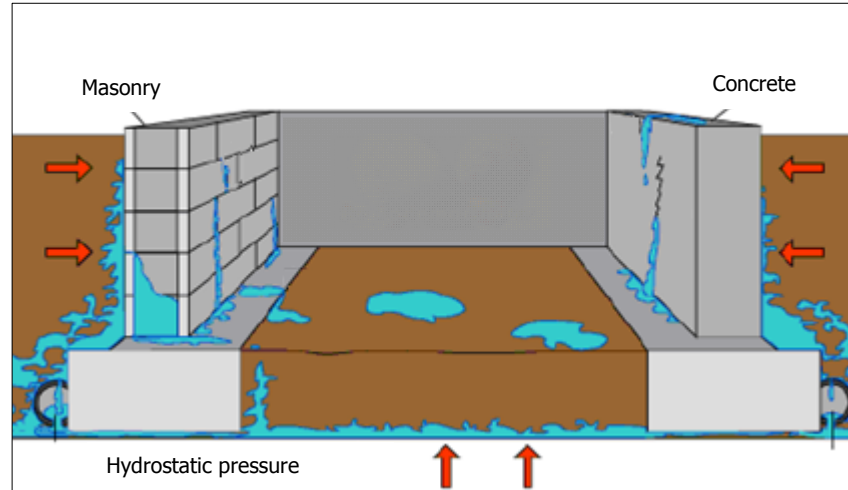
damage inside the building because of humid walls (source: www.devochtbestrijder.nl).
